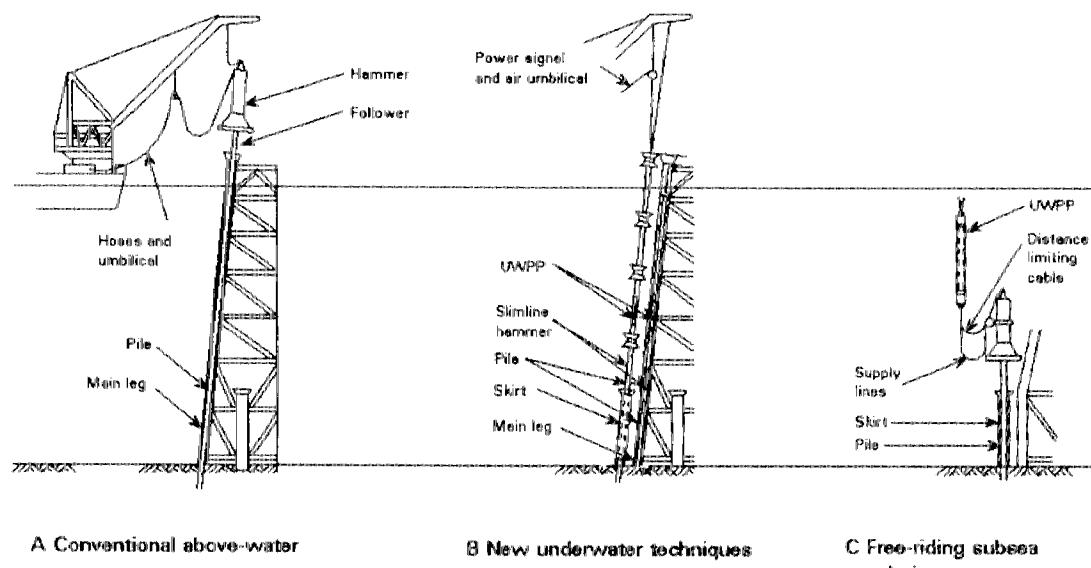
Jacket foundation types with conventional and new pile – driving technique
